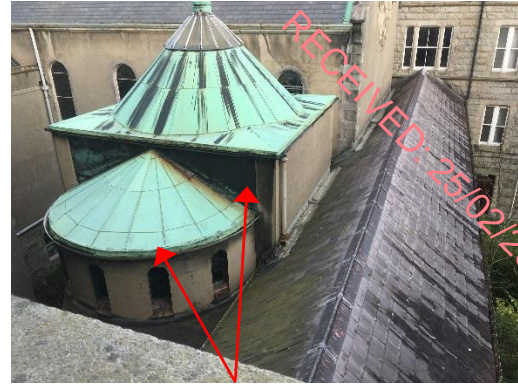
South elevation in context. Note the later infill sacristy and vestments room.
